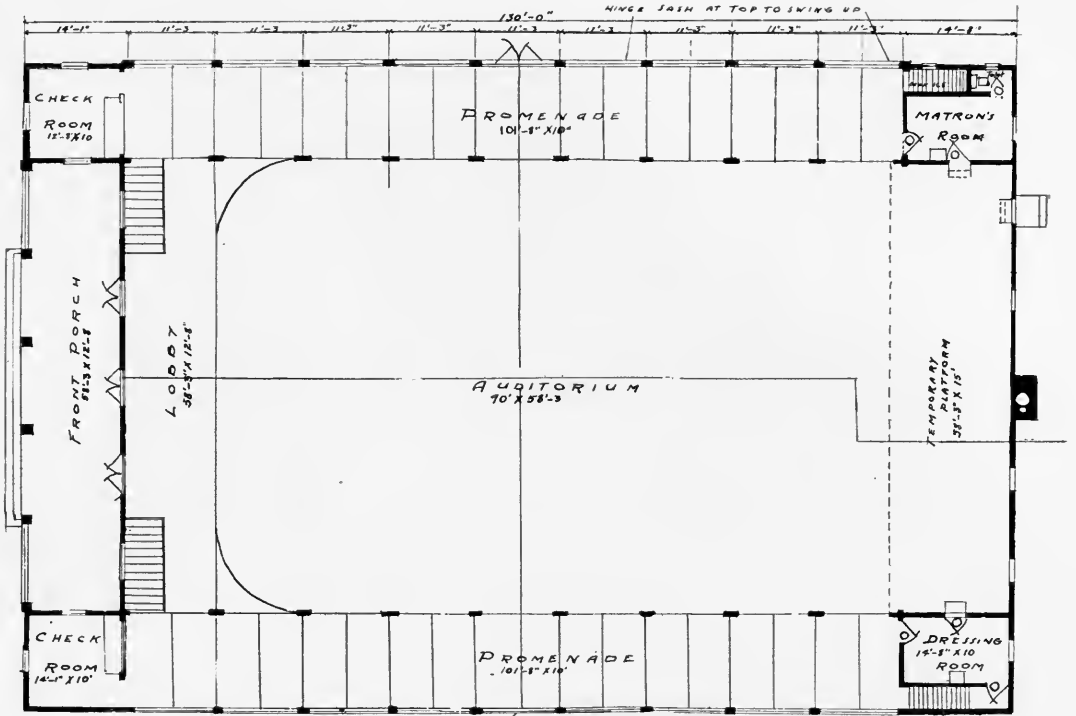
RECREATION PAVILION, HAMILTON PARK, WATERBURY, CONNECTICUT
